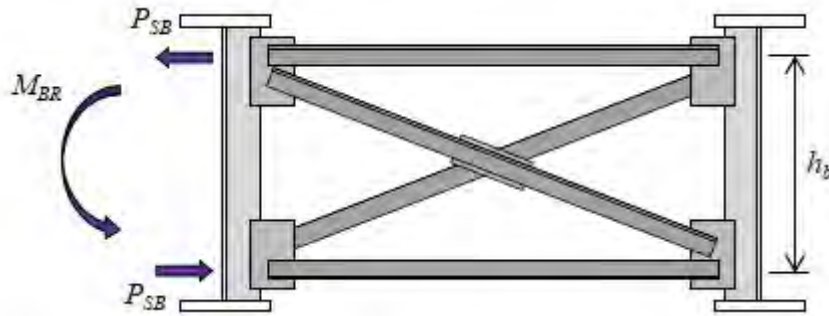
Schematic demonstrating the development of stability bracing forces in cross-frames
